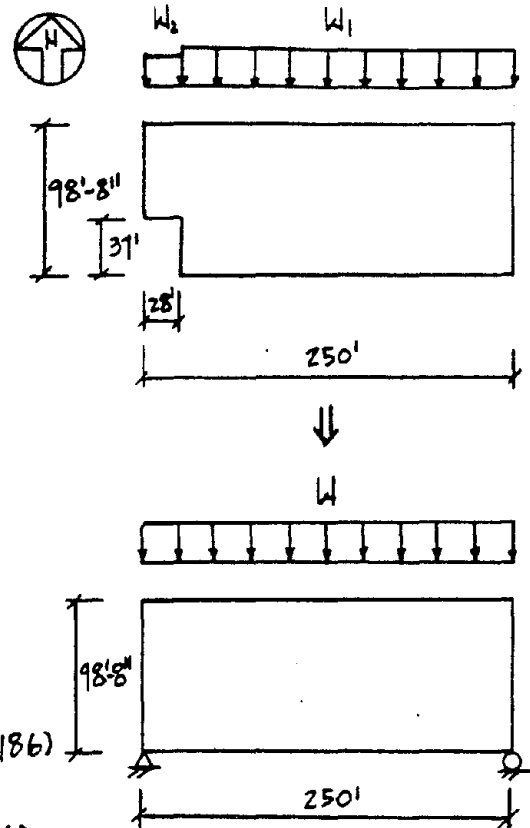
Roof Diaphragm Period, North-South Direction Earthquake, 120 Mast Street Building
